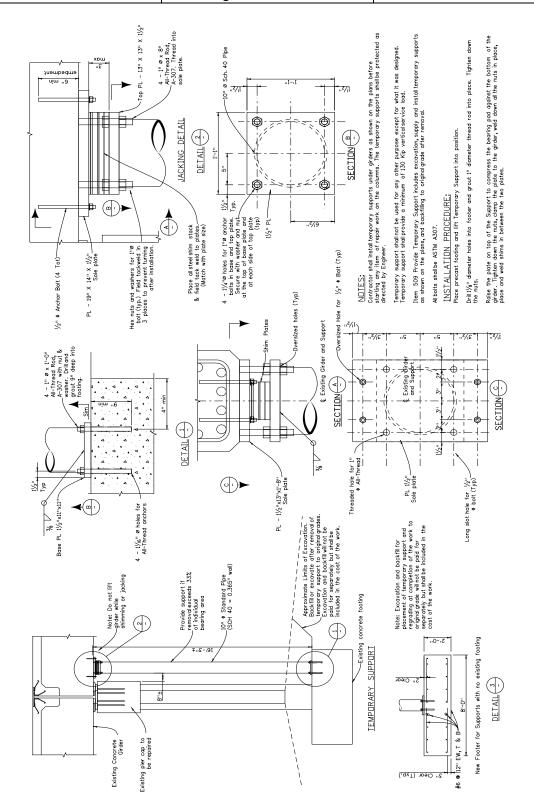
(I)-5 Sample Details for Falsework to Support a Concrete Girder
